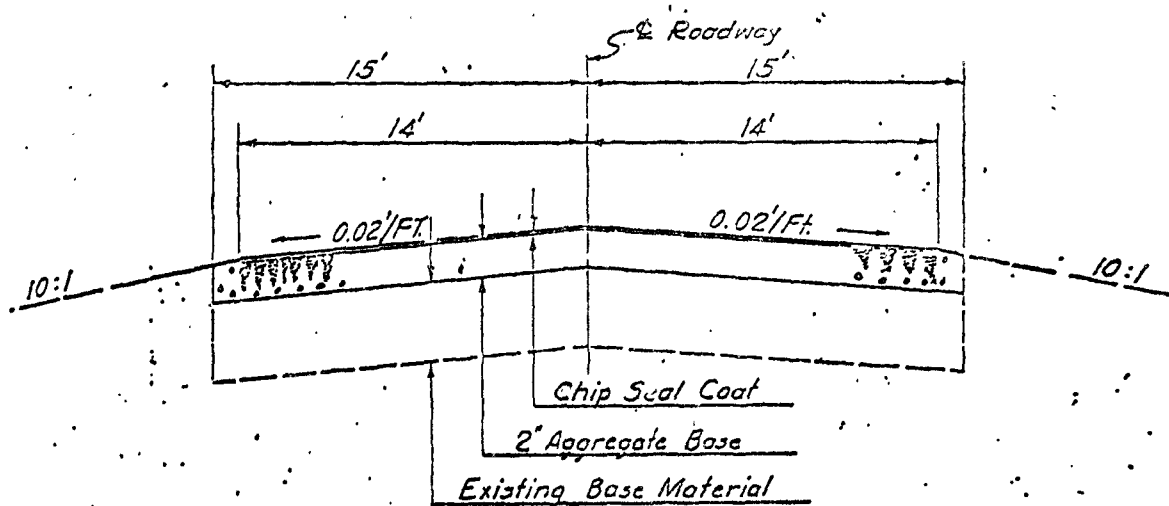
Profile of Typical Section for Chip Seal Road Surface Construction
